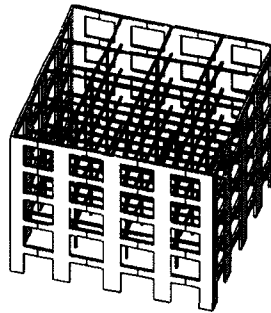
Test plan on floor systems for shear stiffness and strength in plane
